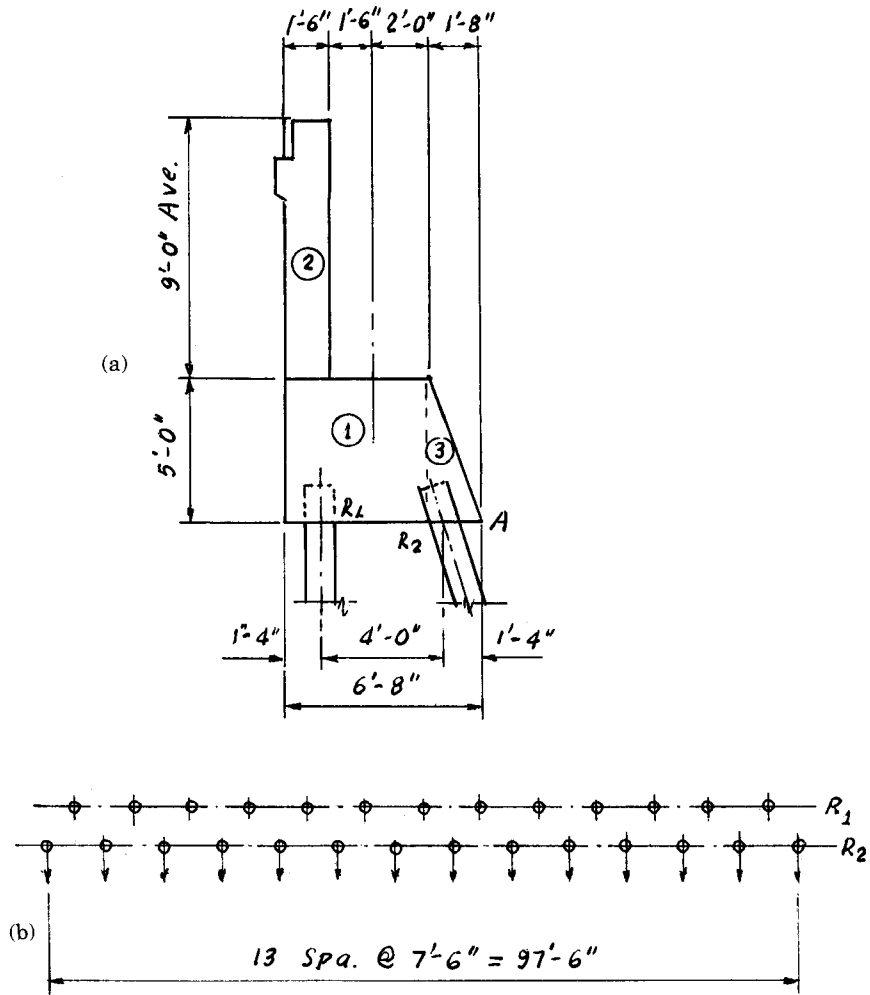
Bent of Design Example 7.1 (a) Preliminary section; (b) pile layout.
